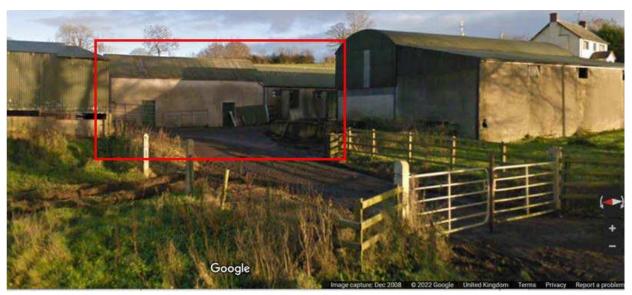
Google image of building as it stands today on site captured in December 2008. The surrounding agricultural building have since been removed and no. 92 Lisaclare Rd the associated dwelling see above to the northeast corner is in the process of being replaced under a recent planning permission.
